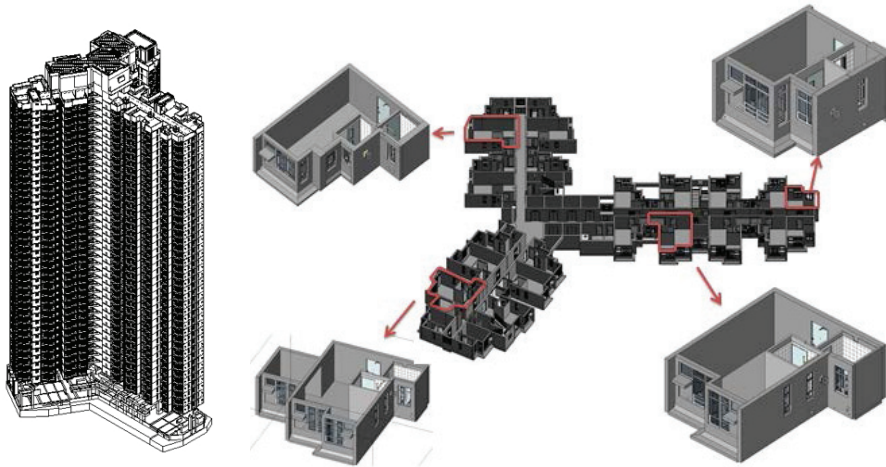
Sampled 40-story public residential building and its typical floor comprised with modular flats (courtesy of HKHA and Yau Lee)
